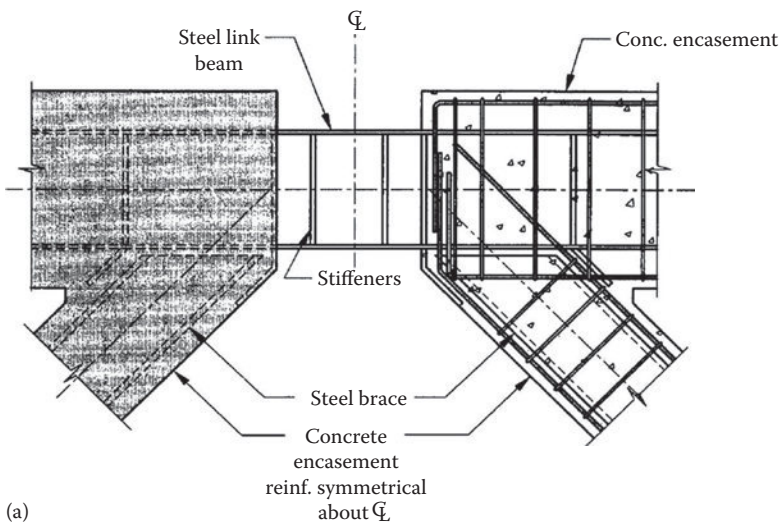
Schematic details of link beam: (a) link at center of beam.
